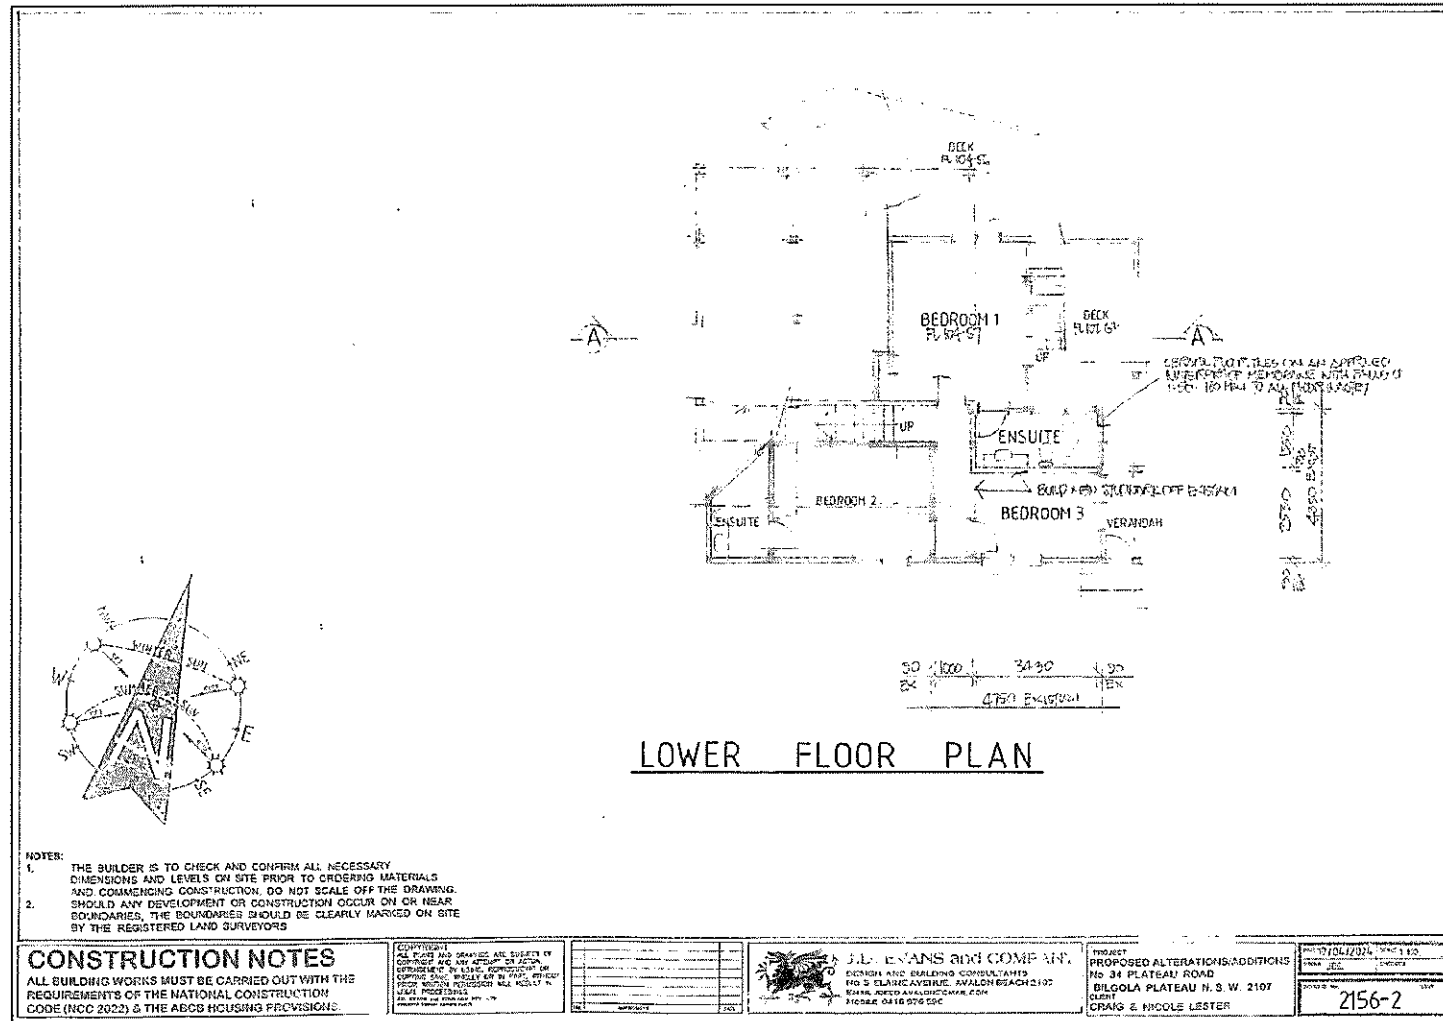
ILLUSTRATES PROPOSED LOWER FLOOR PLAN
